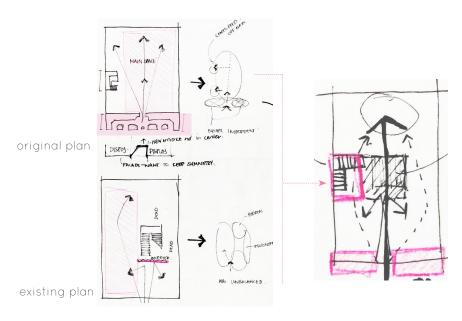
Development of the ground floor plan illustrating inspiration from the original layout of the Saxon Building (Author, 2013)
